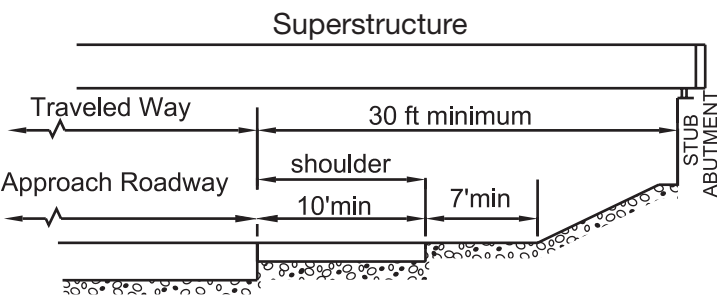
Minimum horizontal clearances to abutment walls measured from the edge of lane.
